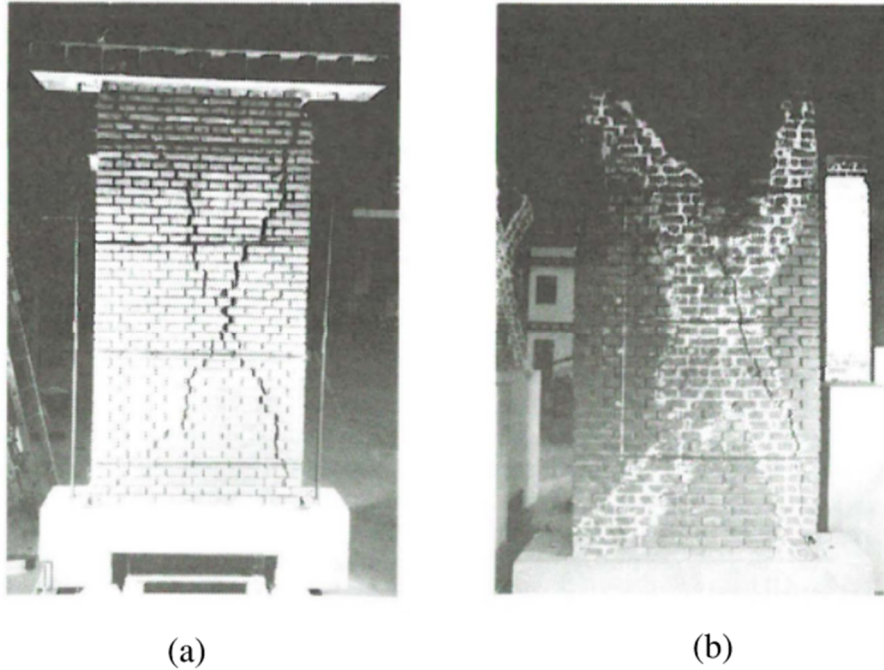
(a) Wall Before Repair (b) Wall After Repair
